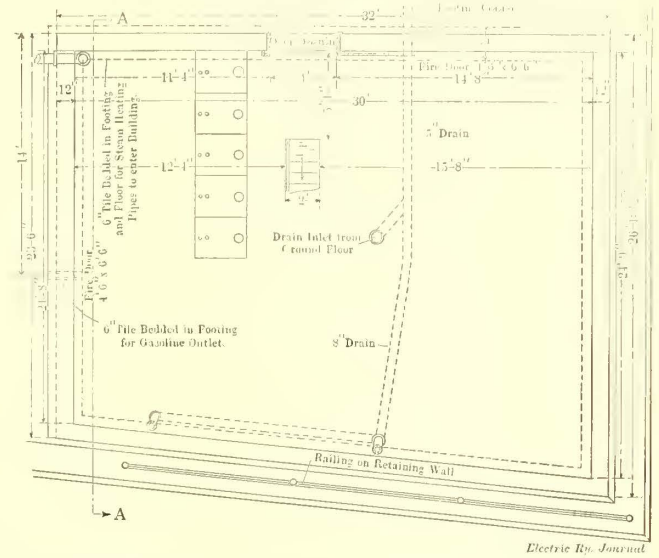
Syracuse Shops—Plan of First Floor of Paint and Oil House
